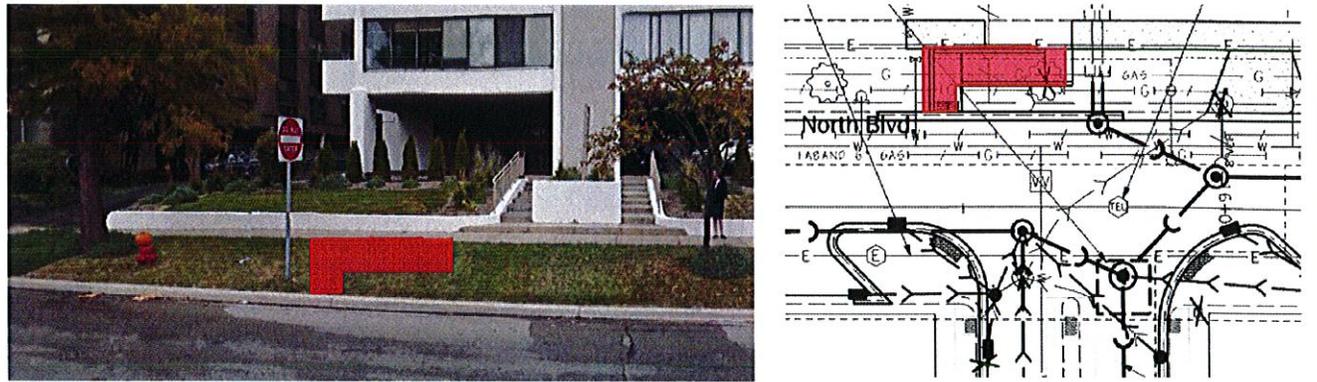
North Boulevard Switchback ADA Ramp. As shown in the above image, the parkway slope at the proposed ADA ramp location is too steep to meet ADA requirements; therefore, the plans are showing a switchback ramp to transition the grades. V3 will build off of the 50%+ plans and provide additional detail for this ADA ramp as well as any other ramps proposed for this project.
